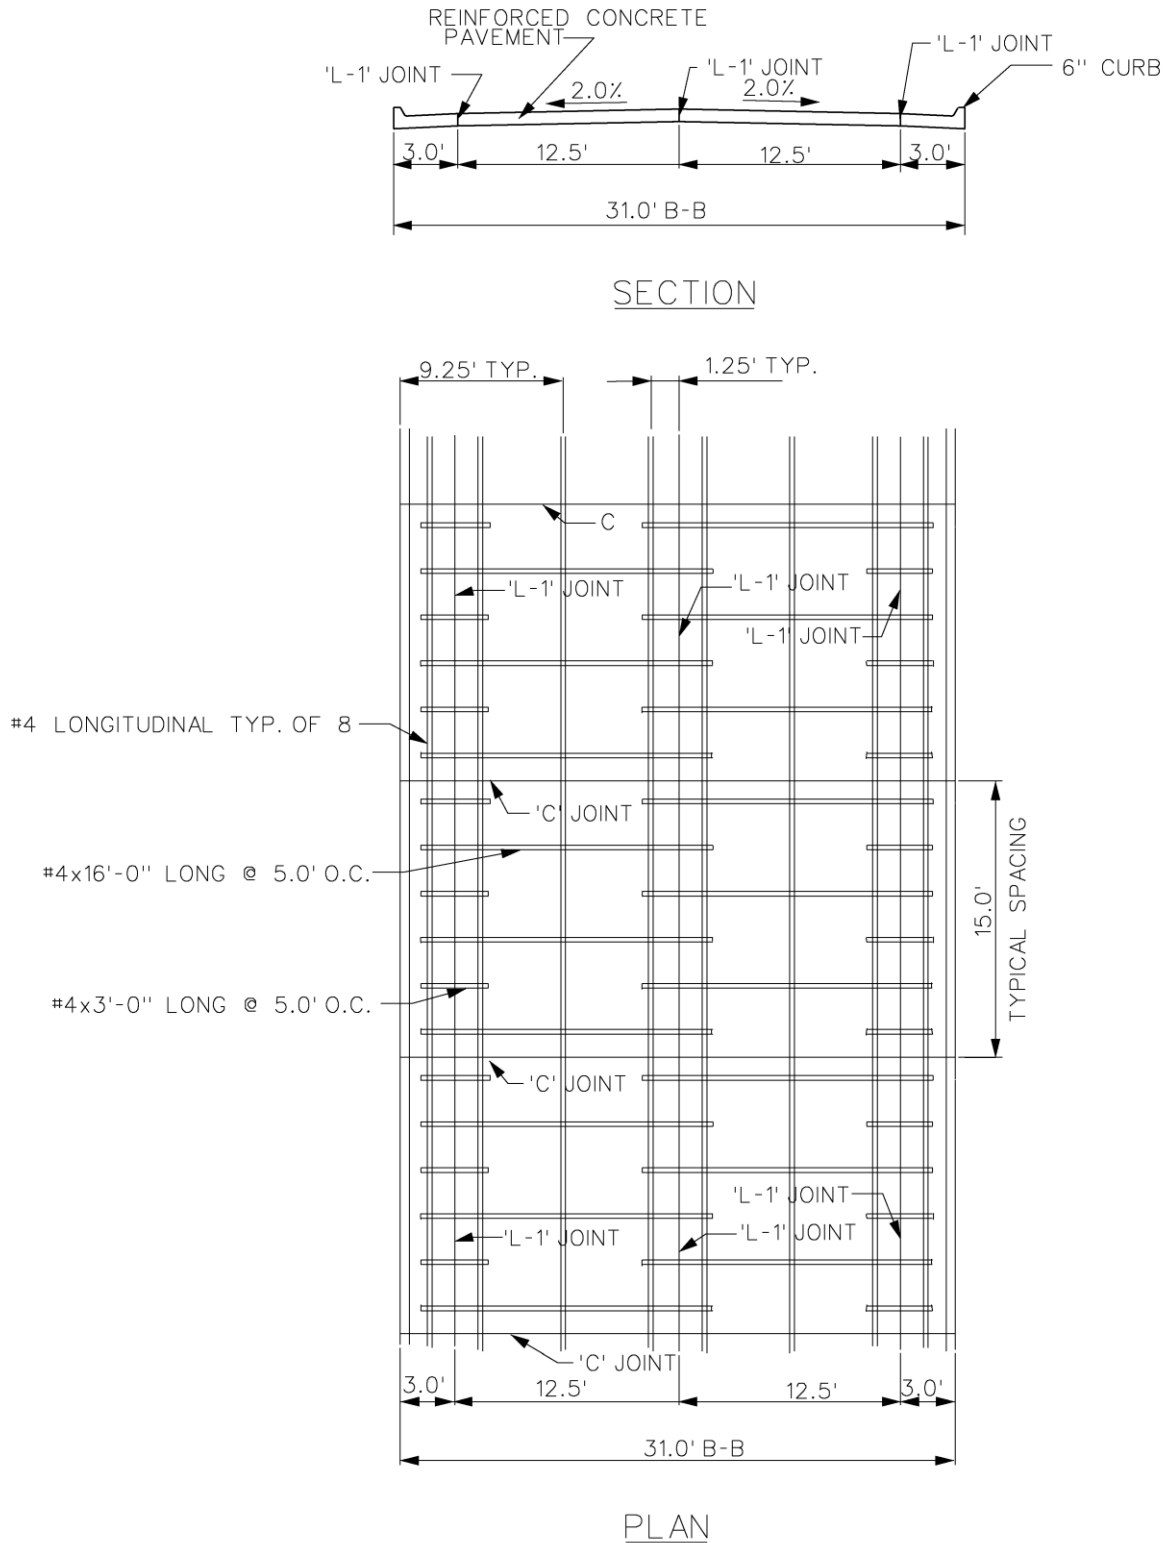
G-2.12: Iowa Jointed Reinforced Pavement Detail - 31' Back-To-Back Street
